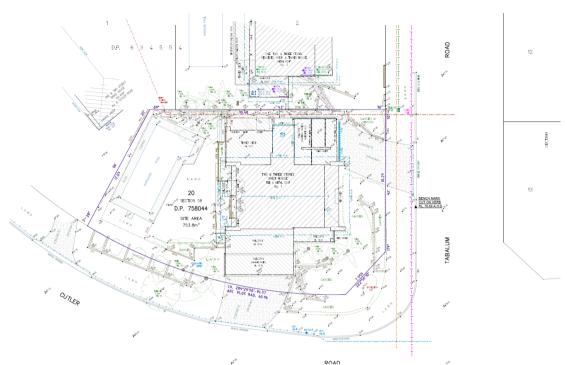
Extract Level & detail survey (source: Bee & Lethbridge Surveyors)
